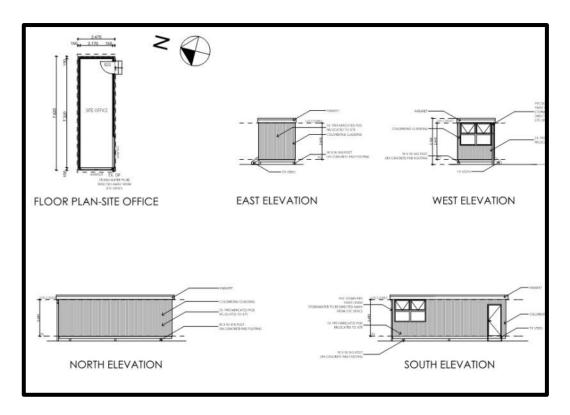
Floor plan and elevations of proposed site office (Design to Live, 2017)
